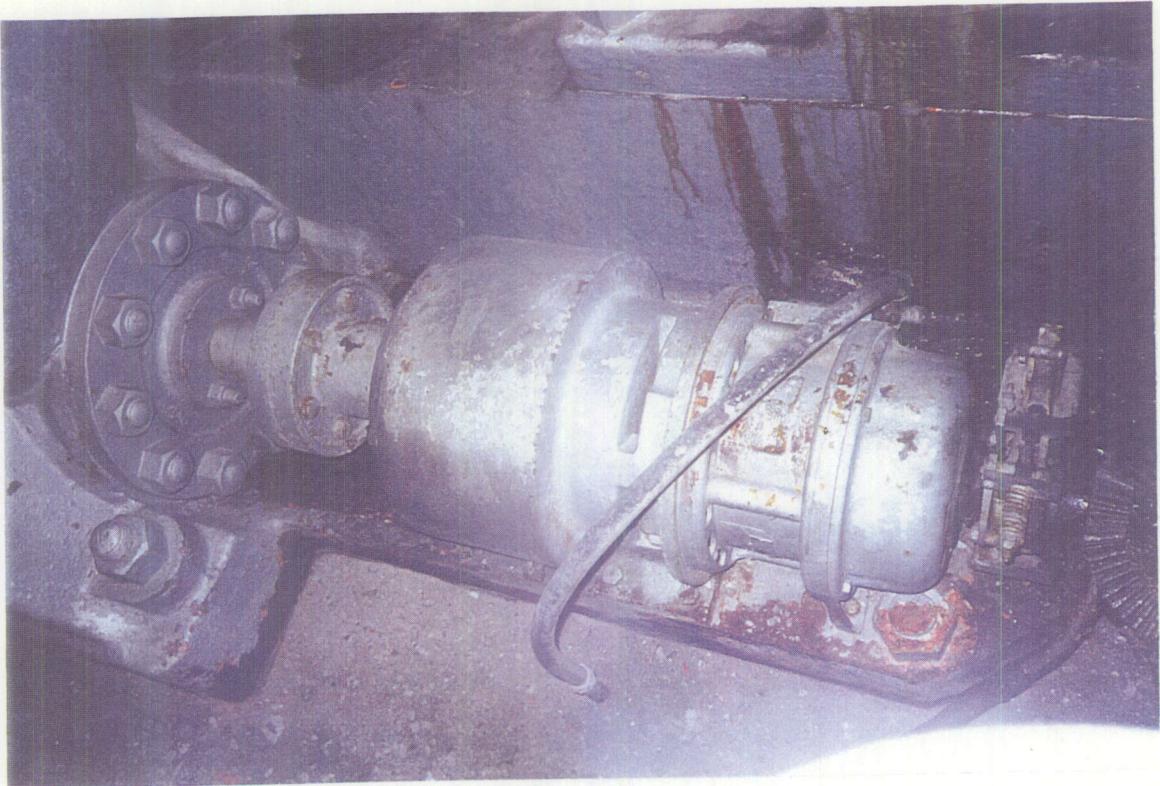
Morris Dam - Butterfly Valve 1A - View of valve operator electric motor.
